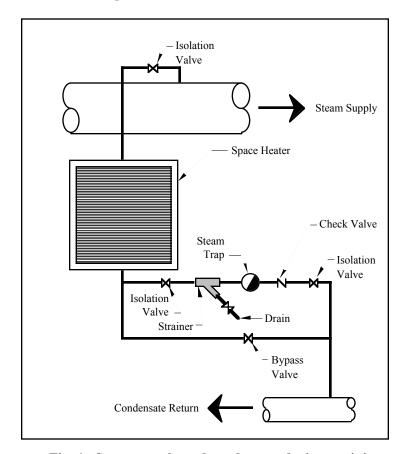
Steam supply and condensate drainage piping for a common space heater.
